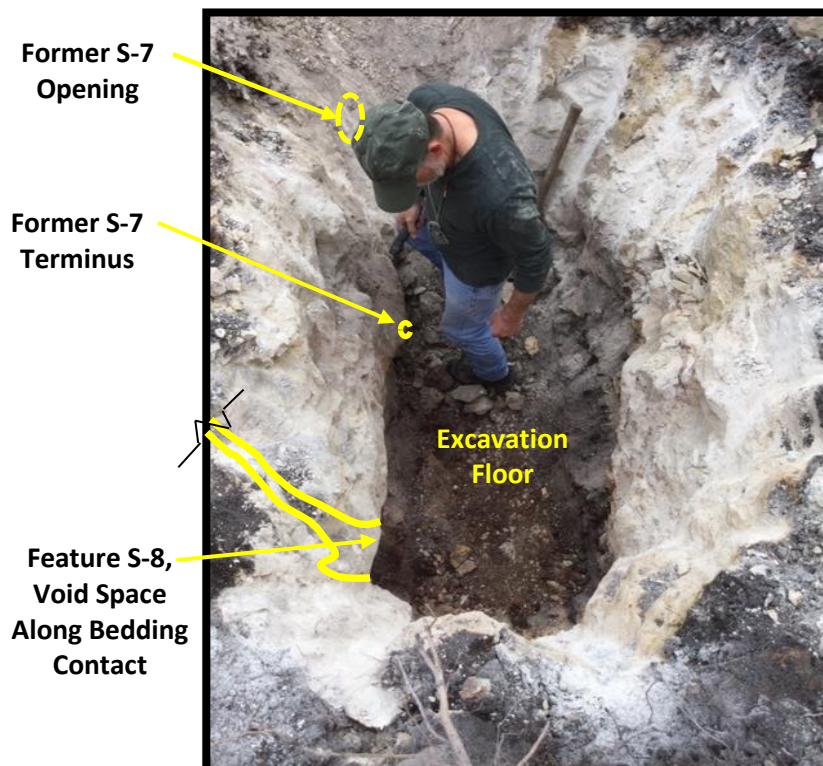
Final excavation extent. Feature S-7 is completely removed and was determined to be terminated at the weathered limestone contact zone (excavation floor).
